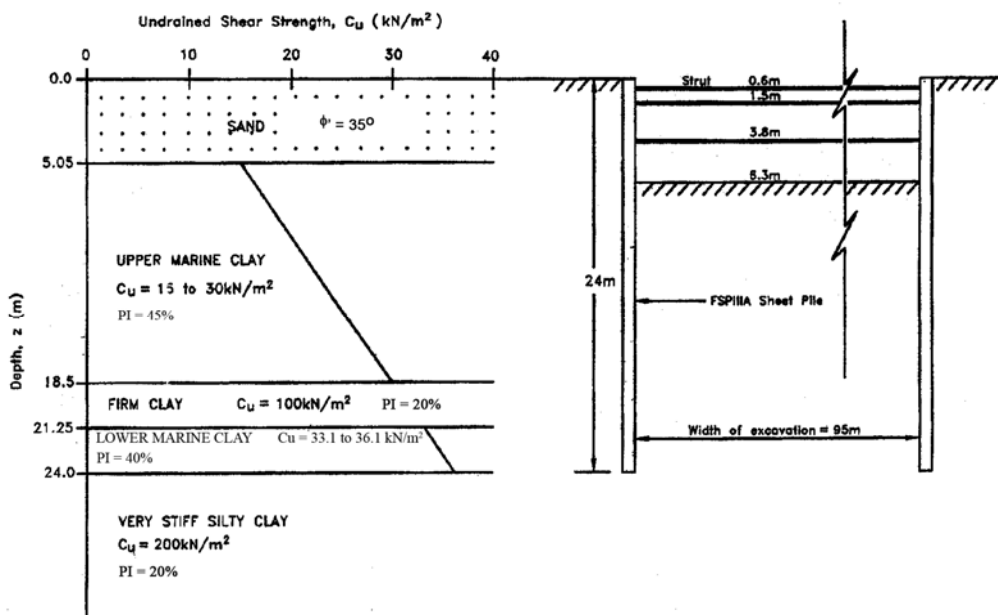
Cross-Section of Excavation at Rochor Complex (Lim et al., 2003)
